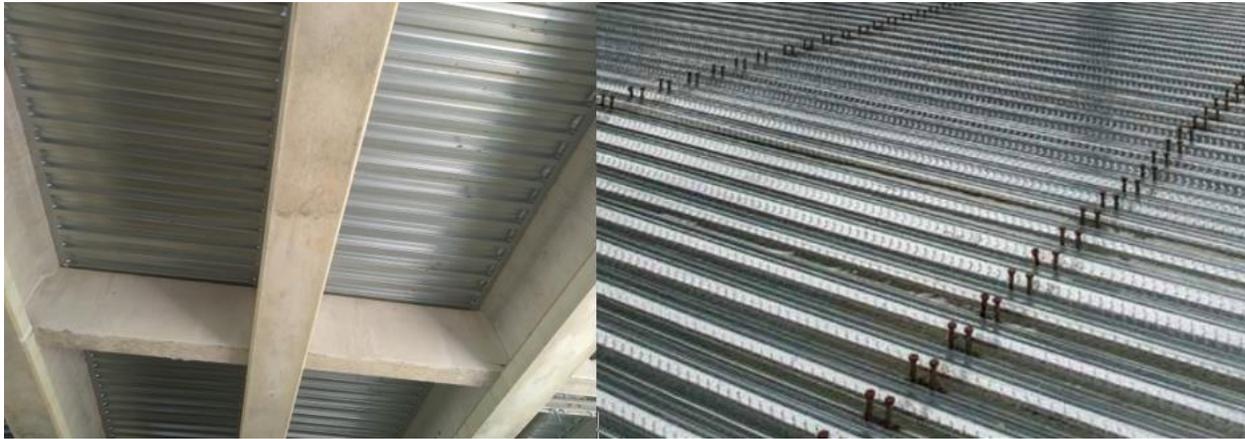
Steel-form partial deck on beams with studs projecting for composite concrete
